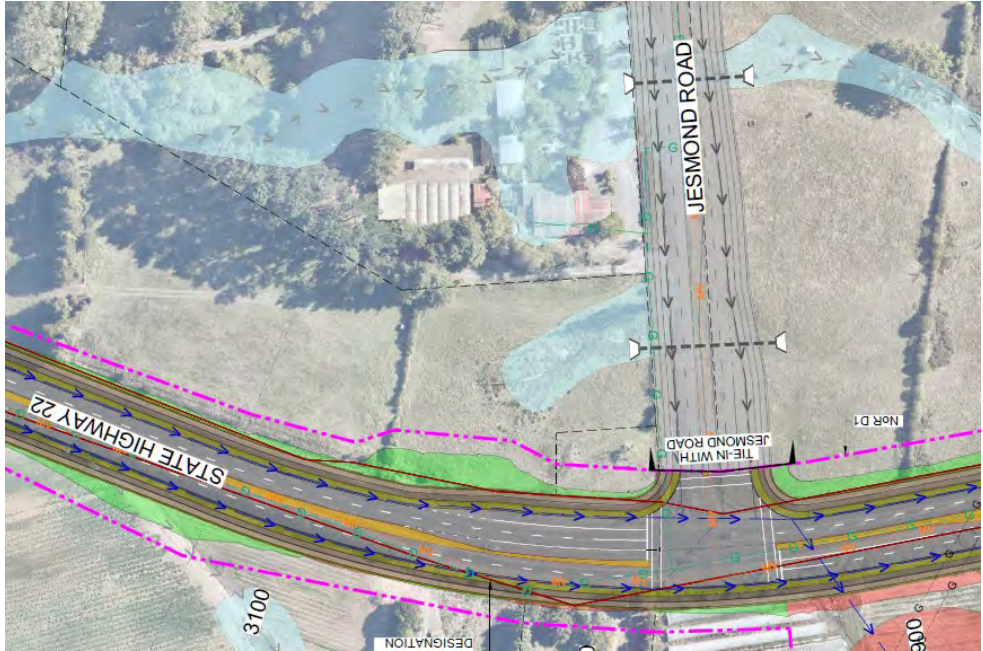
General arrangement plan – intersection of Jesmond Road and Karaka Road (SH22)
